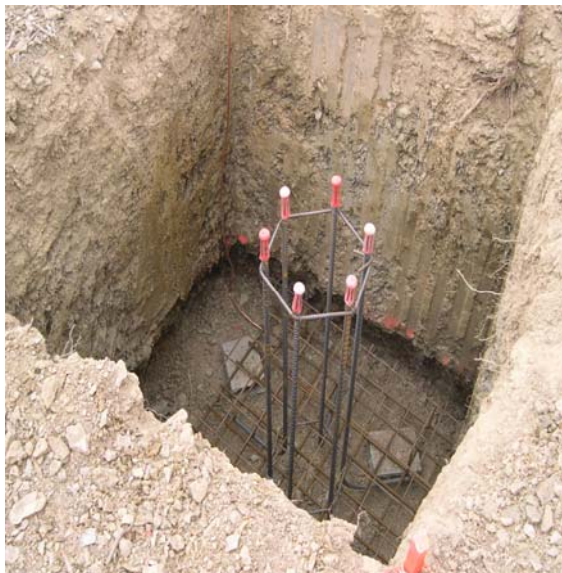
Foundation reinforcement showing concrete block spacers
